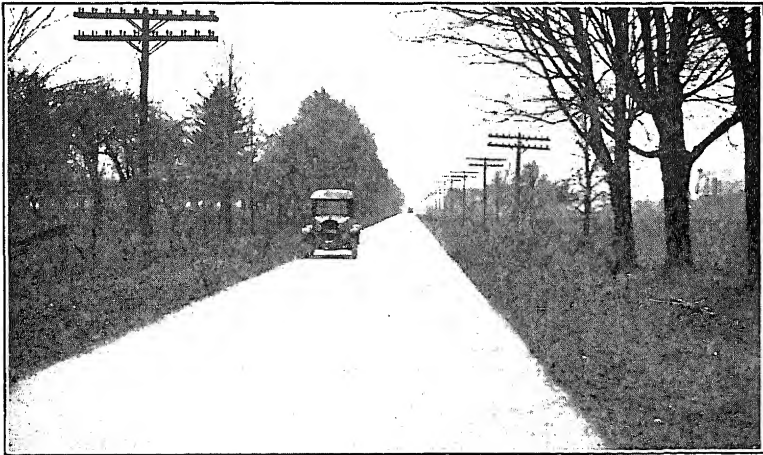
Typical rigid pavement highway (Industrial District Ohio). Note the shallow ditch which adds to the safety of traffic.
